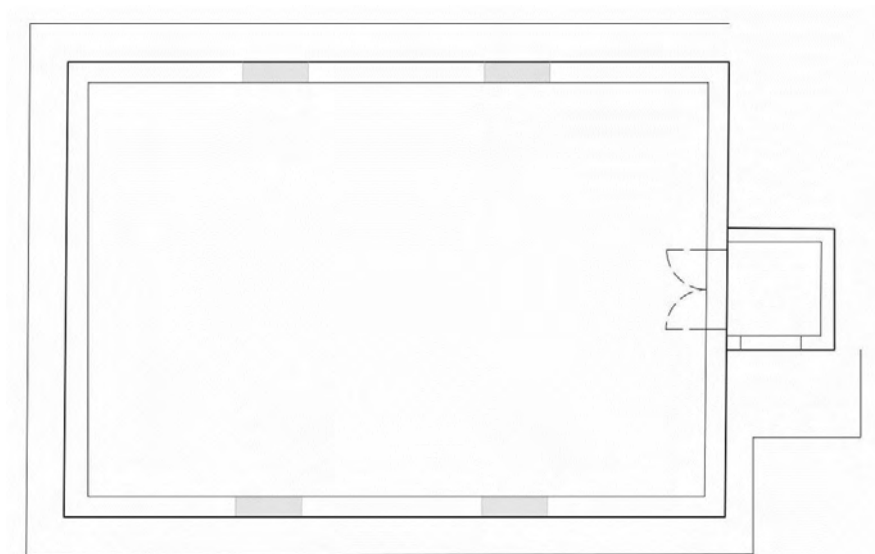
Floor Plan showing the internal layout of the Methodist Church (not to scale). (Source: Craig & Rhodes, 2010).
